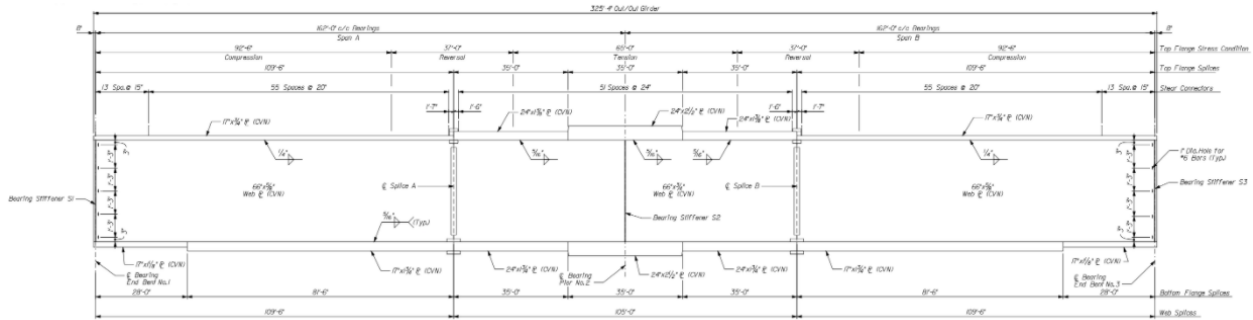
Typical Plate Girder Elevation for Structure I69-057-09506 (NBI 80226) (INDOT, 2010)
